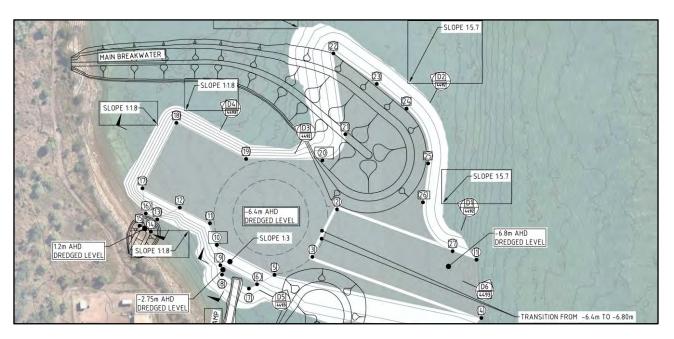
Dredge layout (extract from design drawing R21-4491)
